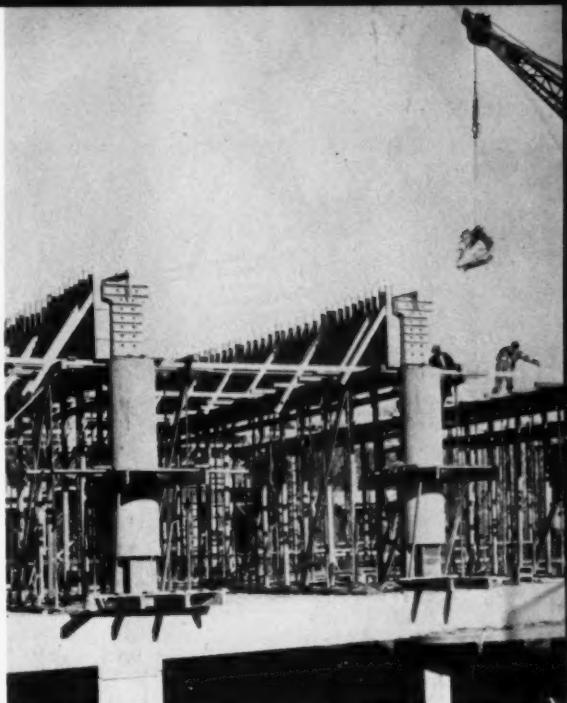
Formwork for two of the concrete girders. At right, one of the precast concrete brackets is being lowered into place. Note the two precast end anchorage blocks already in place.
